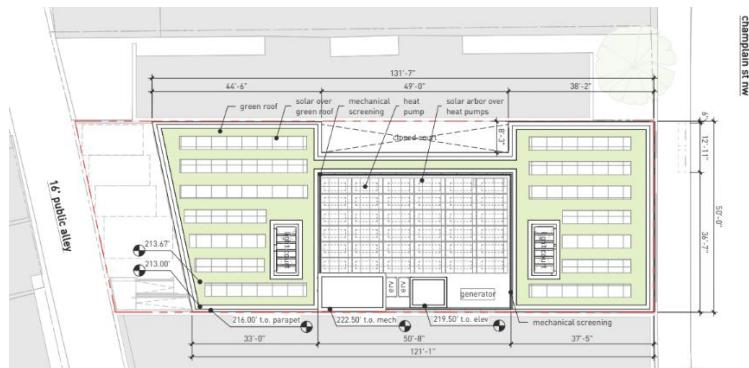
Proposed roof plan of the Project showing significant extent of green roof area and rooftop solar.
